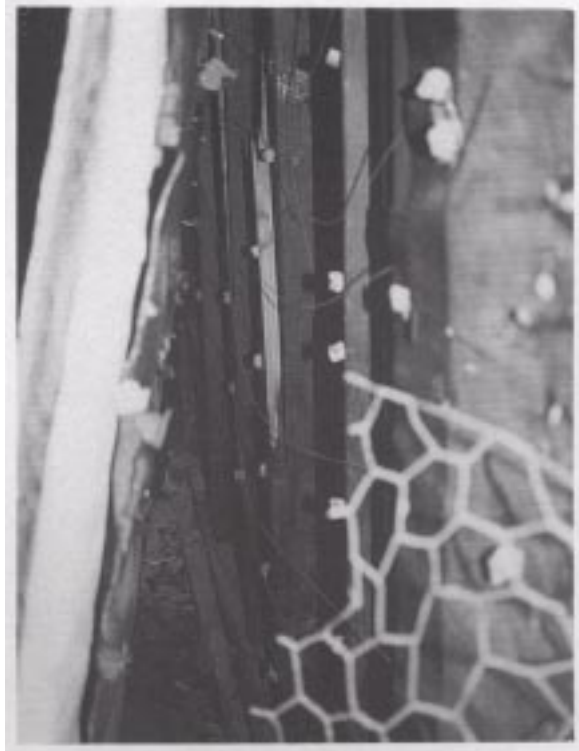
Pulling back the stucco to view longitudinal splitting of studs and stucco adhering to nail heads only inside the shear wall of Figure 53.
